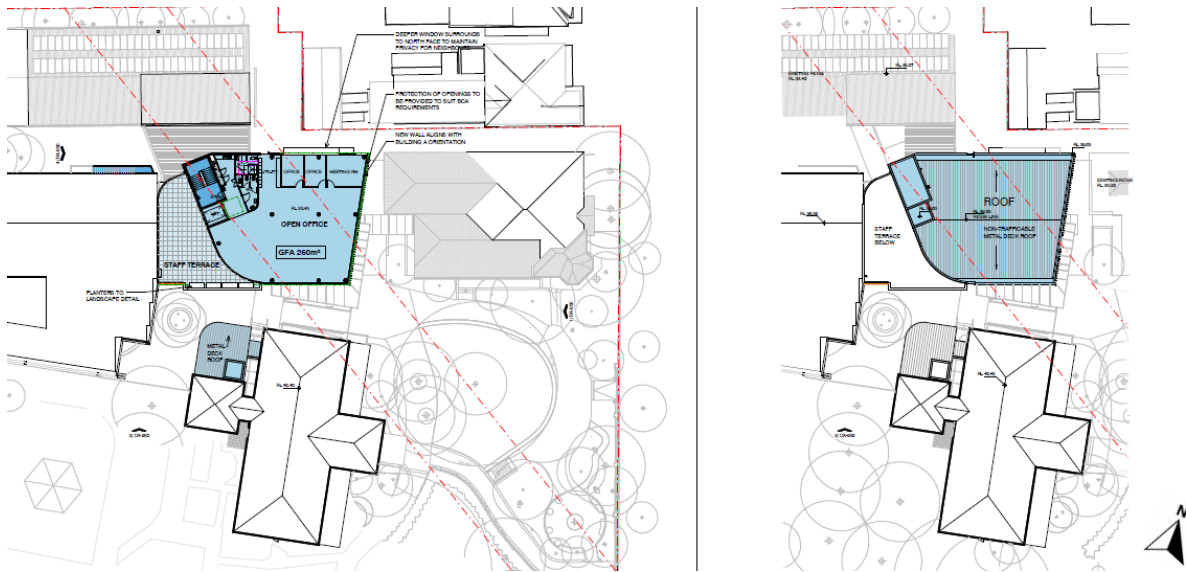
Proposed second floor plan (left) and proposed roof plan (right)
